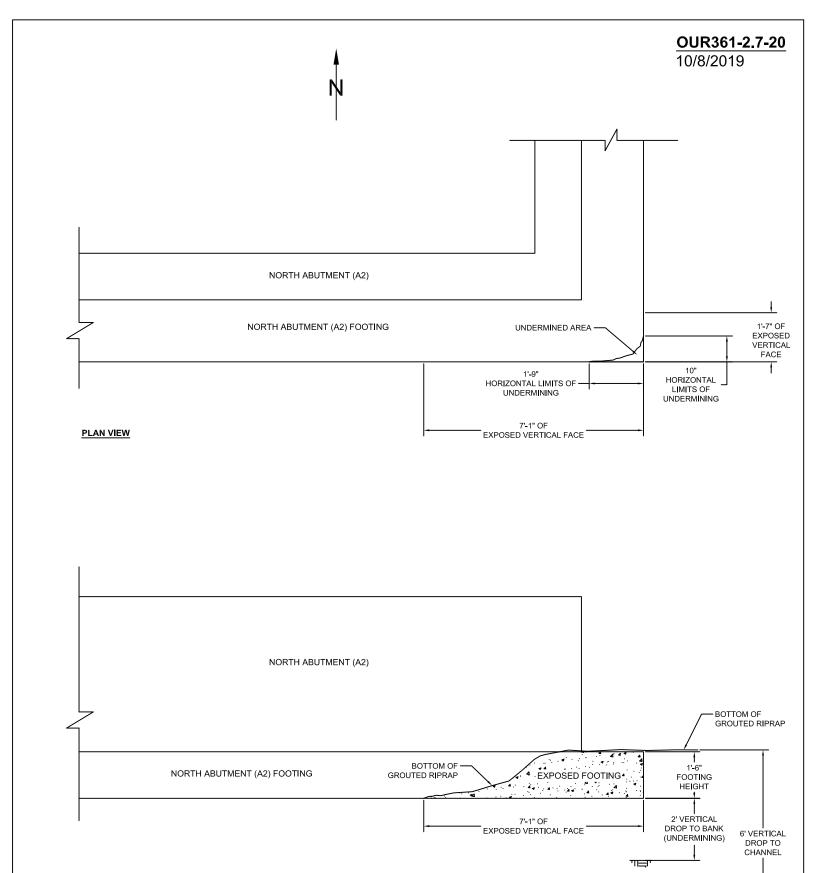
Overview of exposed footing showing measurements of the extent of undermining
